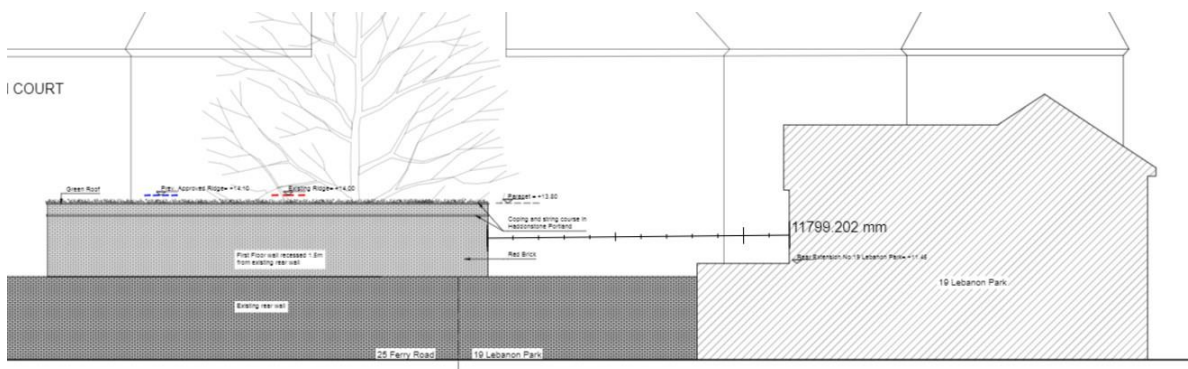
Proposed rear elevation (extract from submitted drawing SC-PP2-07 Proposed Rear Elevation)
